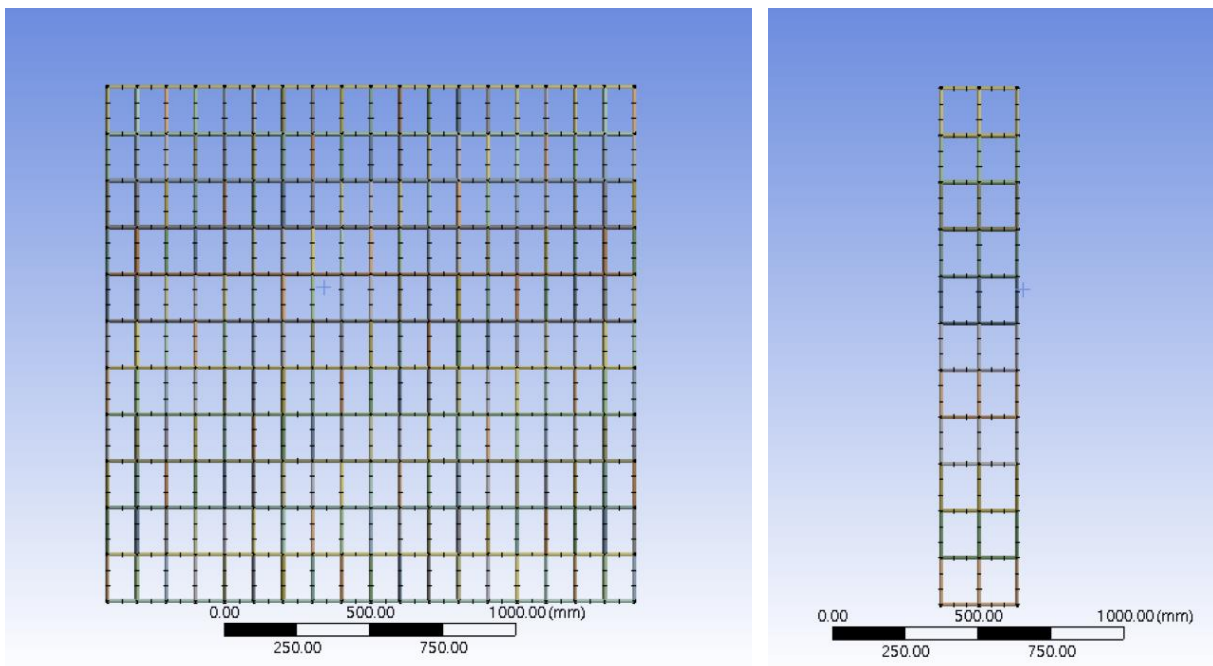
3D Model of Steel Bars at Front and Side Views.
